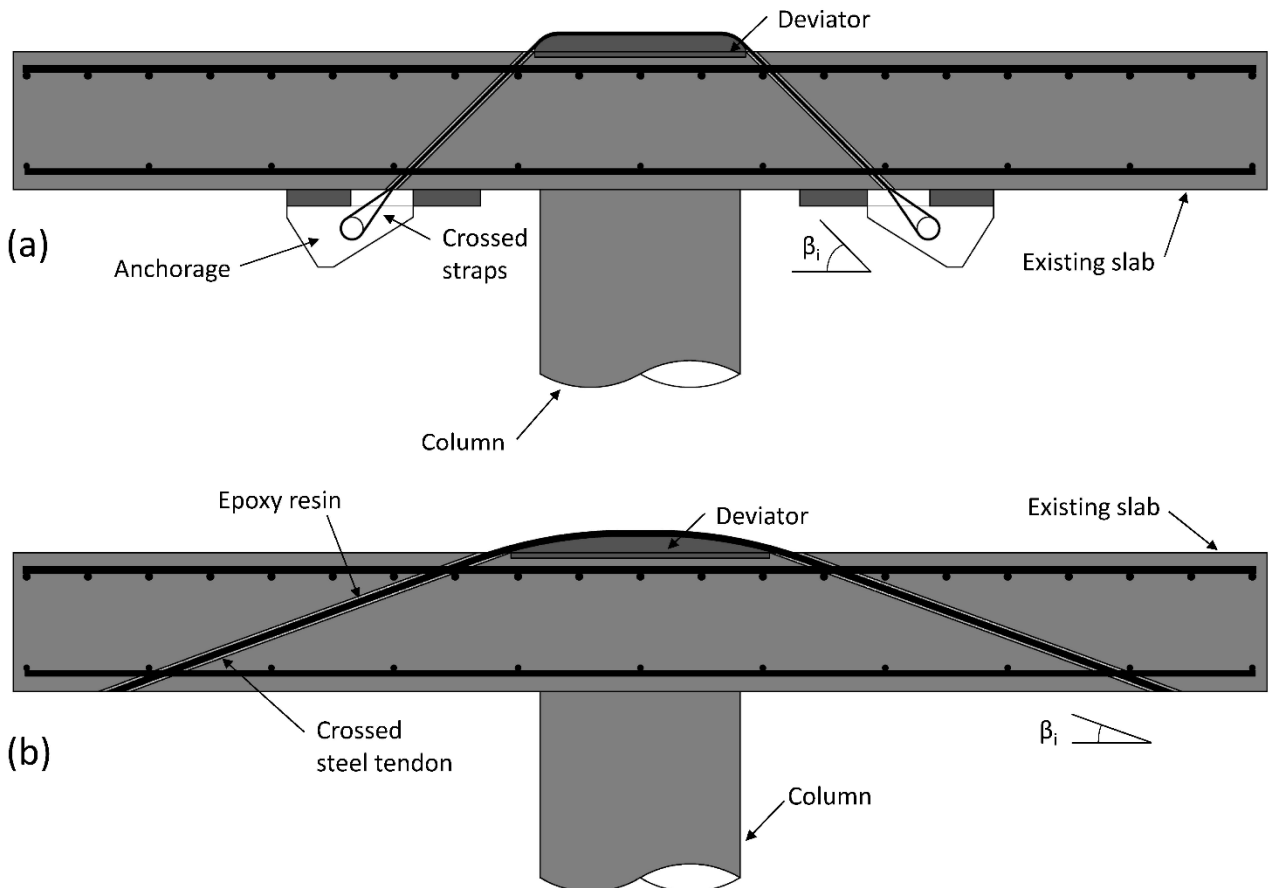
prestressing system for shear strengthening: (a) CFRP straps anchored with steel plates (adapted from Koppitz et al. [31]); (b) steel straps anchored by bonding (adapted from Faria et al. [29])
